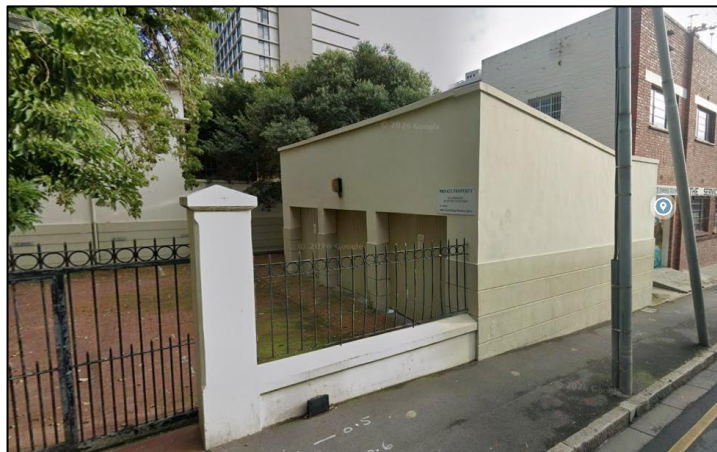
Photo of car park access gate and garage where BH3 will be drilled.
